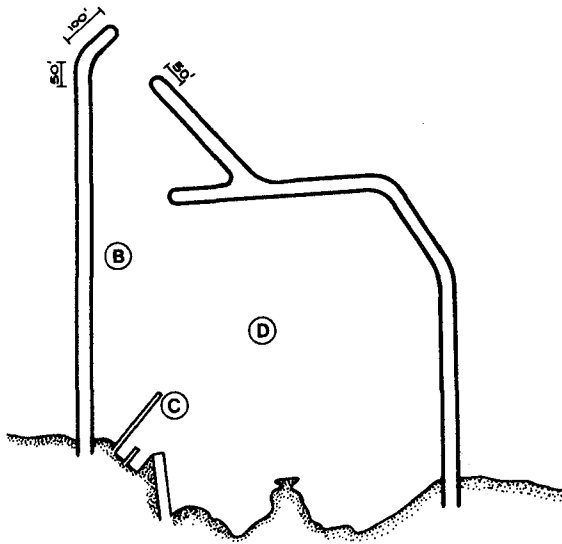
MODEL LAYOUT OF ALTERNATIVE 14: ANGLED EXTENSION OF WEST BREAKWATER
